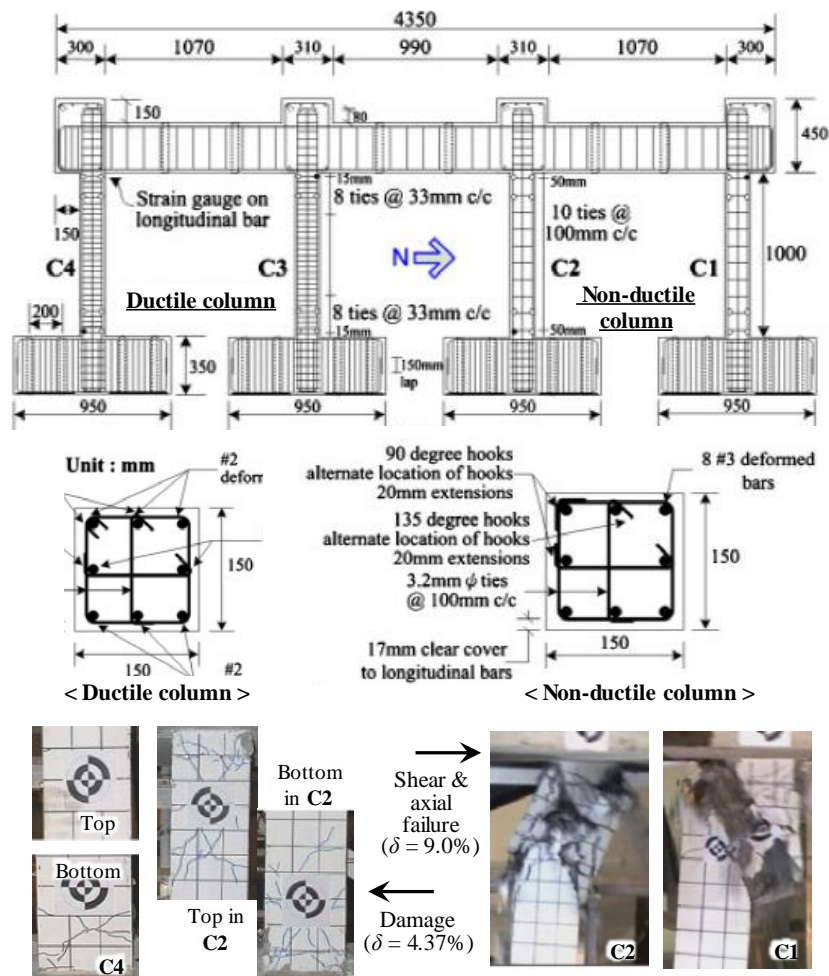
Reinforcement details of frame specimen in Wu et al. (2009)
